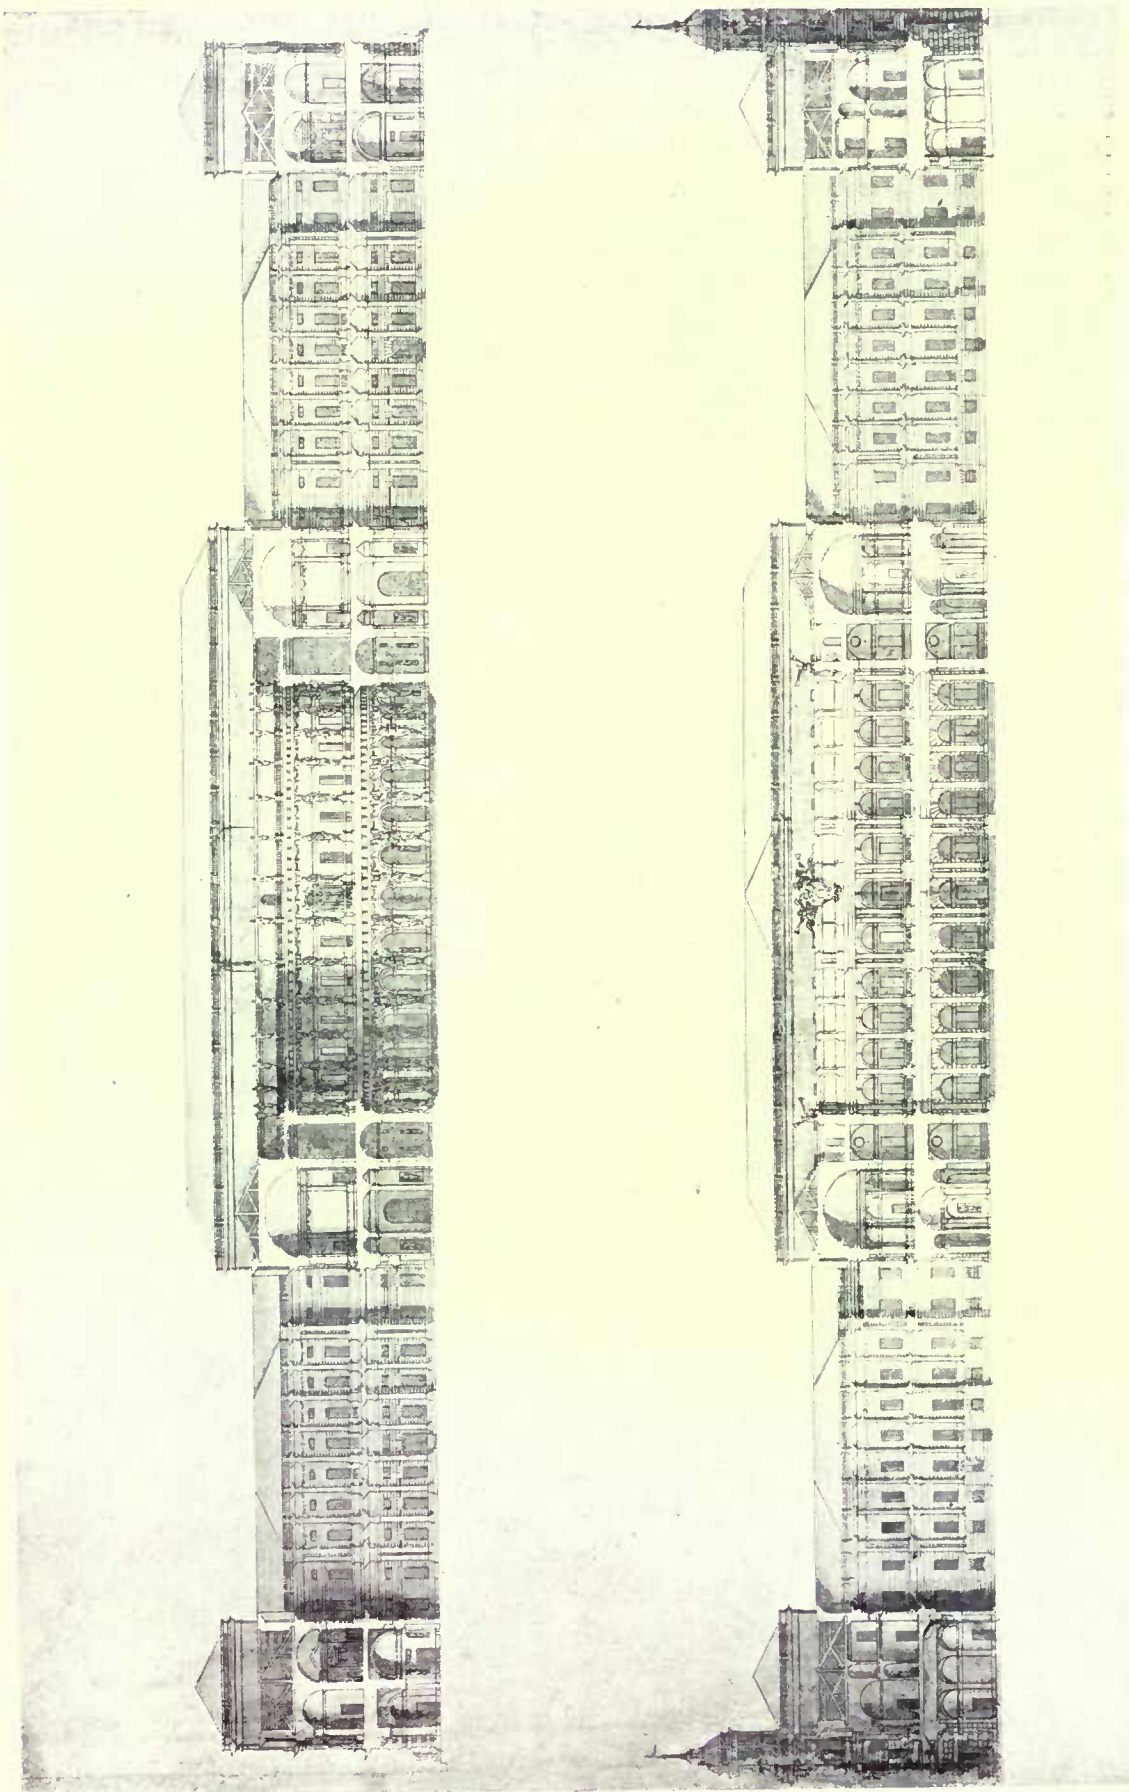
SECTIONS RELATING TO THE PLAN, FIG. 6
